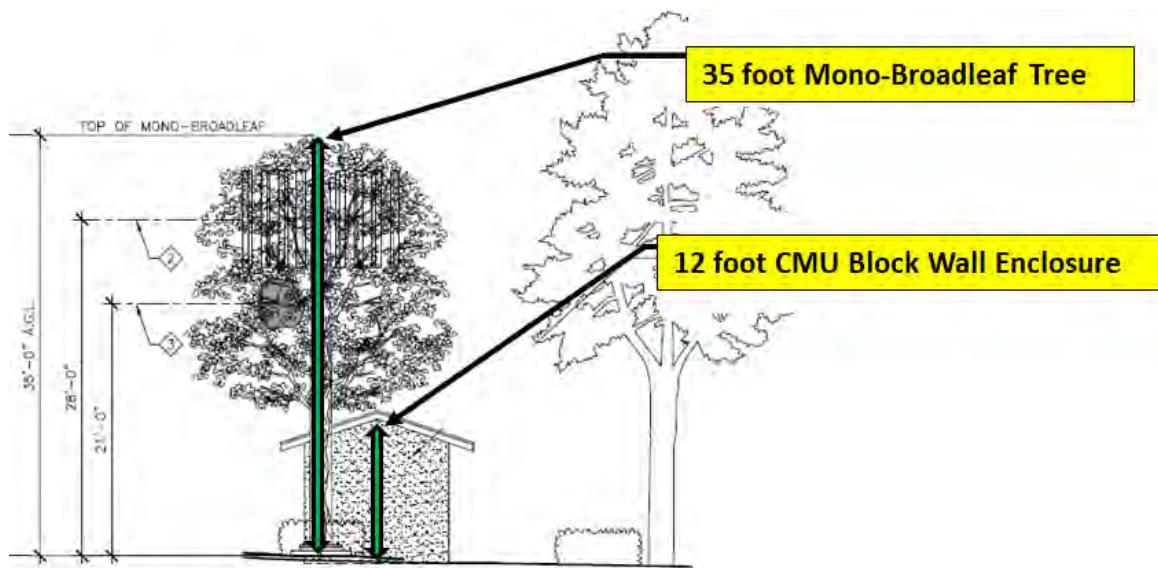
Proposed mono-broadleaf tree and CMU block wall enclosure.
